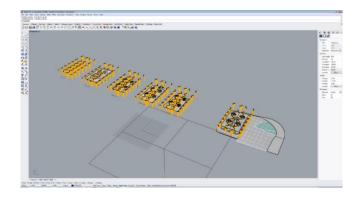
7. Structural system applications to the geometric form on Rhino as 3D view. (Source: Office B)
